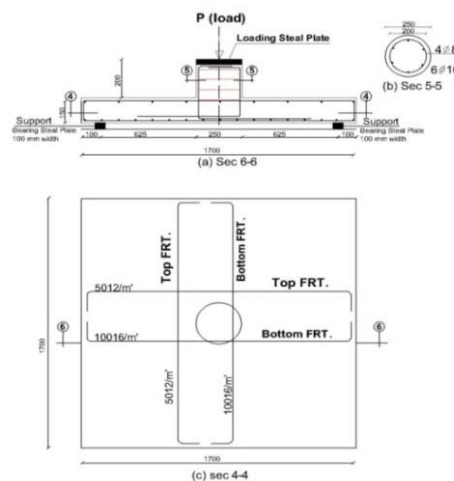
Typical dimensions and reinforcement details of slab Sc [9].
